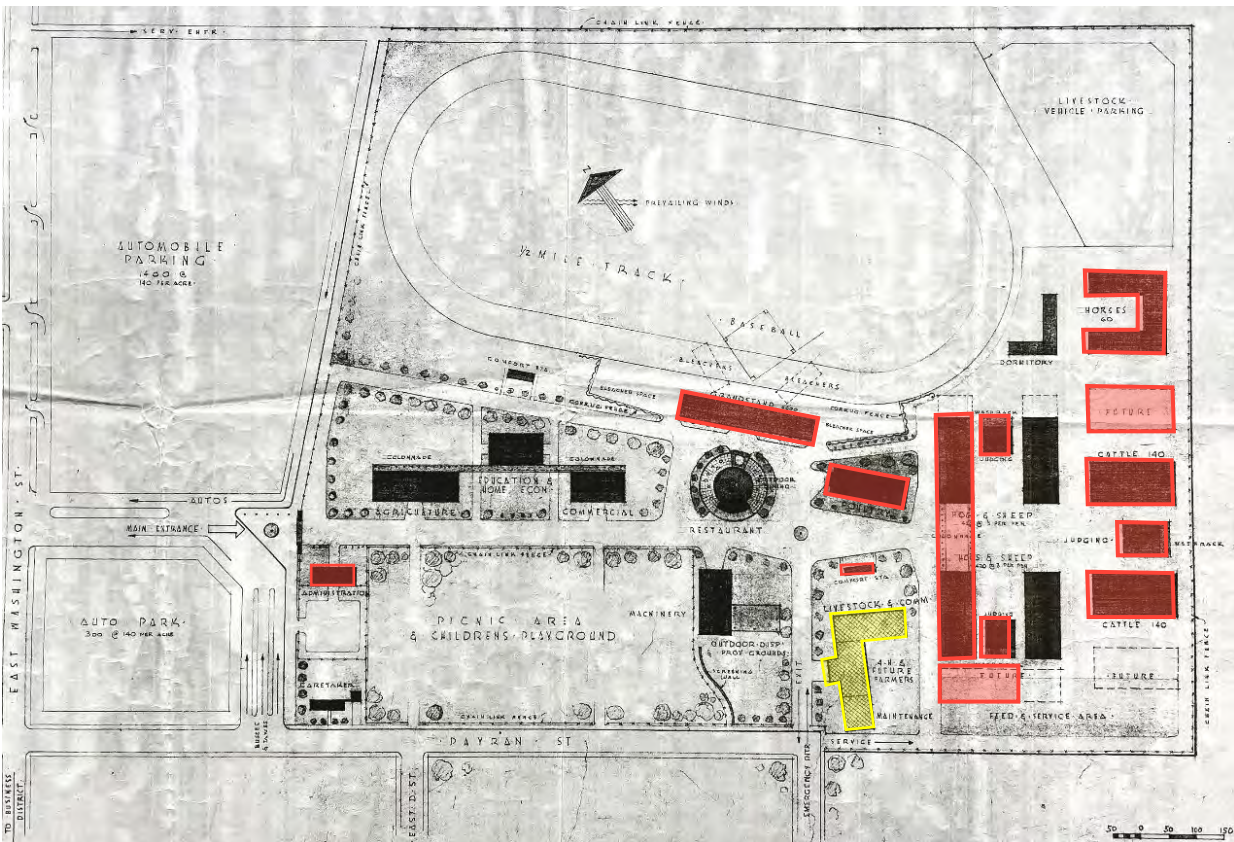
Master Plan drawing dated November 1946. Adopted by the Fair Board in 1947. Buildings shaded and outlined in red were constructed according to the Master Plan. Building shaded and outlined in yellow was the only existing building that was incorporated into the Master Plan. Source: Sonoma-Marin Fair Archives. Edited by Page & Turnbull.
